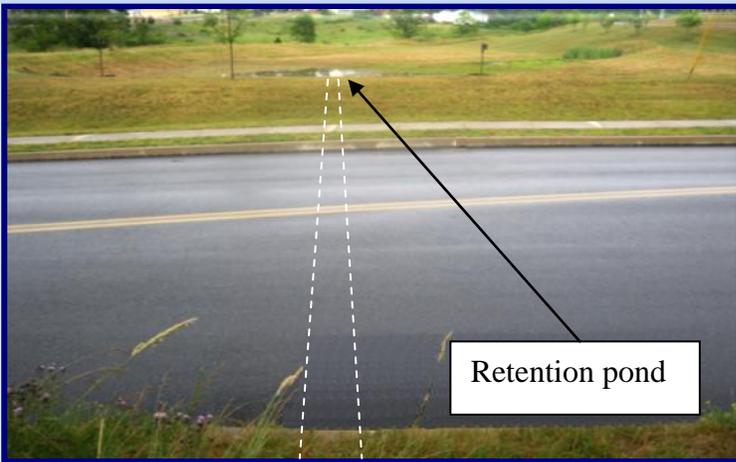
An example of an enclosed surface storm water facility that drains a retention pond but does not connect to a highway enclosed storm water facility
